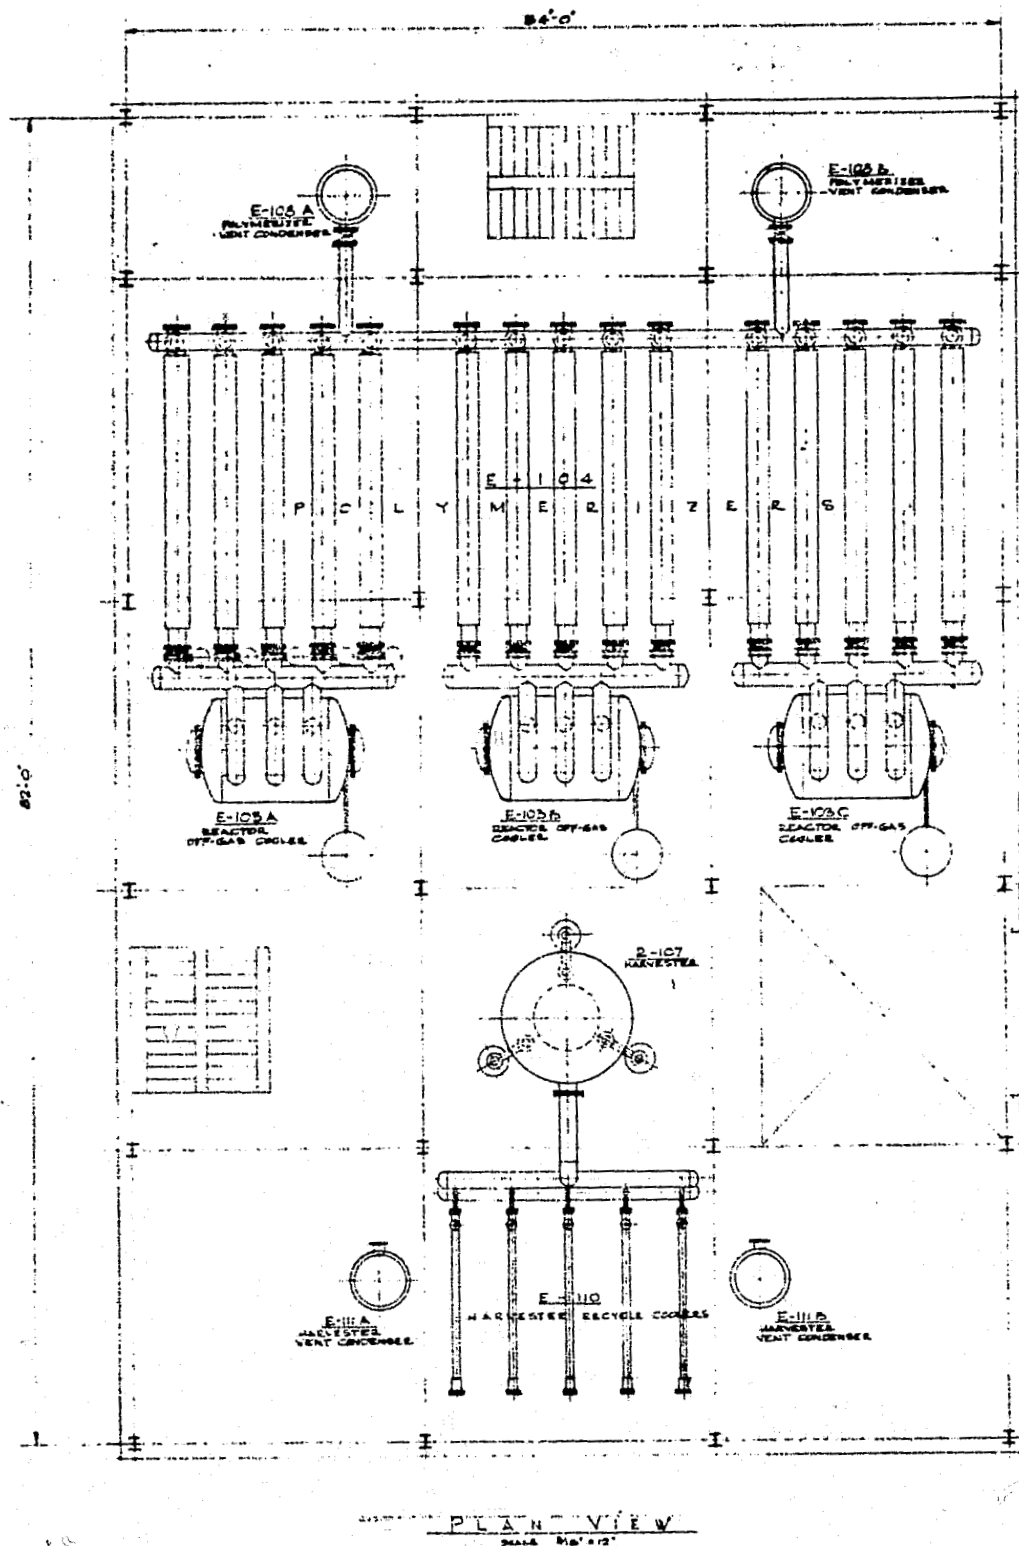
Conceptual layout of 100 MT/yr plant.
